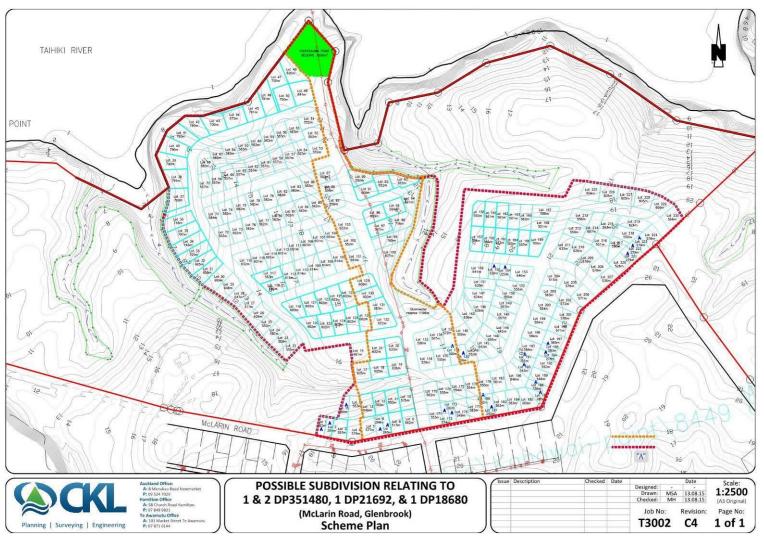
Proposed Concept Plan for Stage 1 (Courtesy Rangatu)
